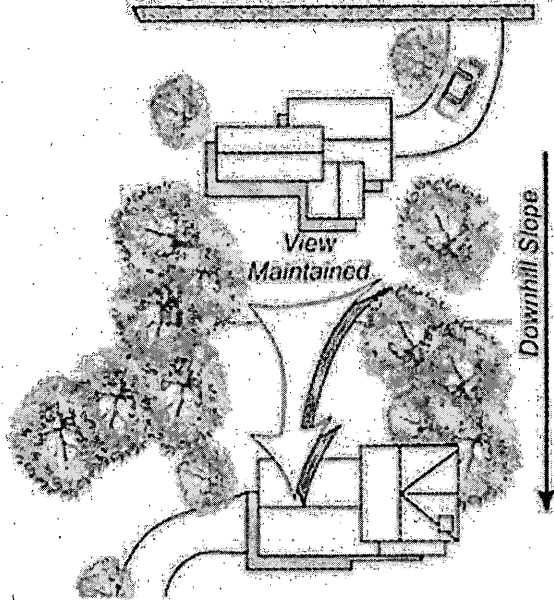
Example of Preferred Location of Second Floor to Preserve Views
